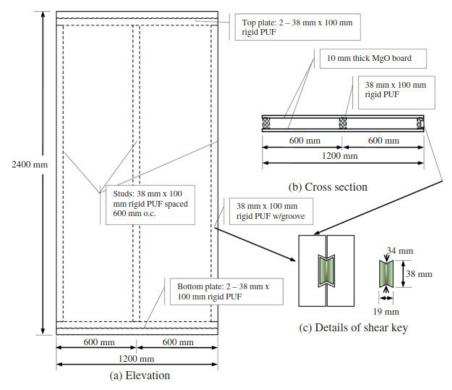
Details of the prefabricated composite walls made from rigid PUF and MgO board.
